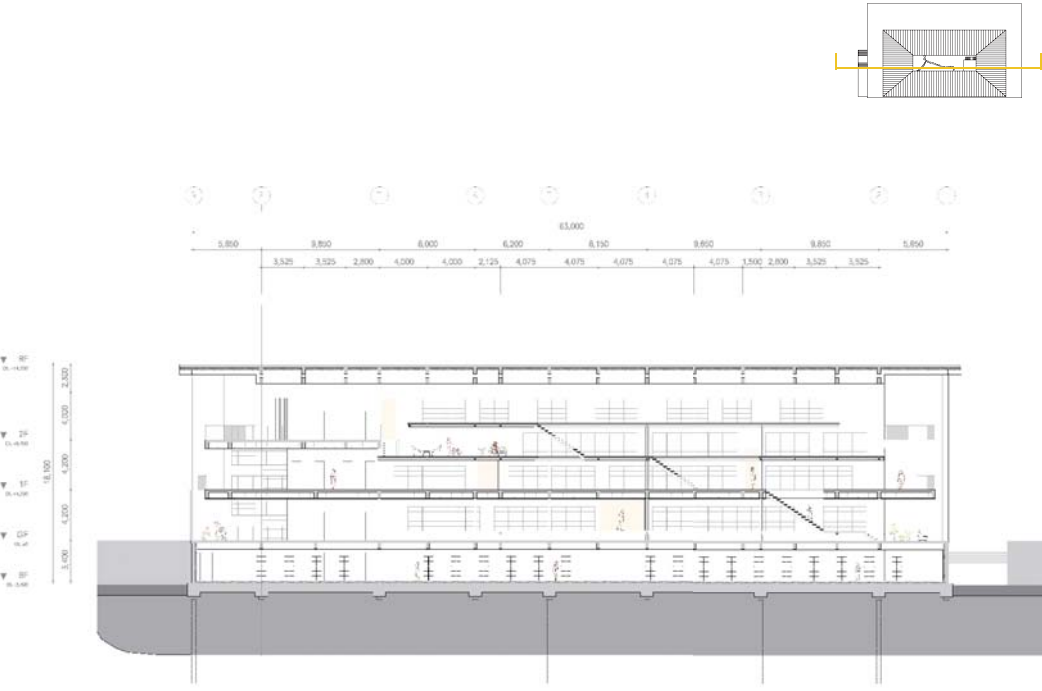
Longitudinal Section 1:200 (Yoo, 2021)
